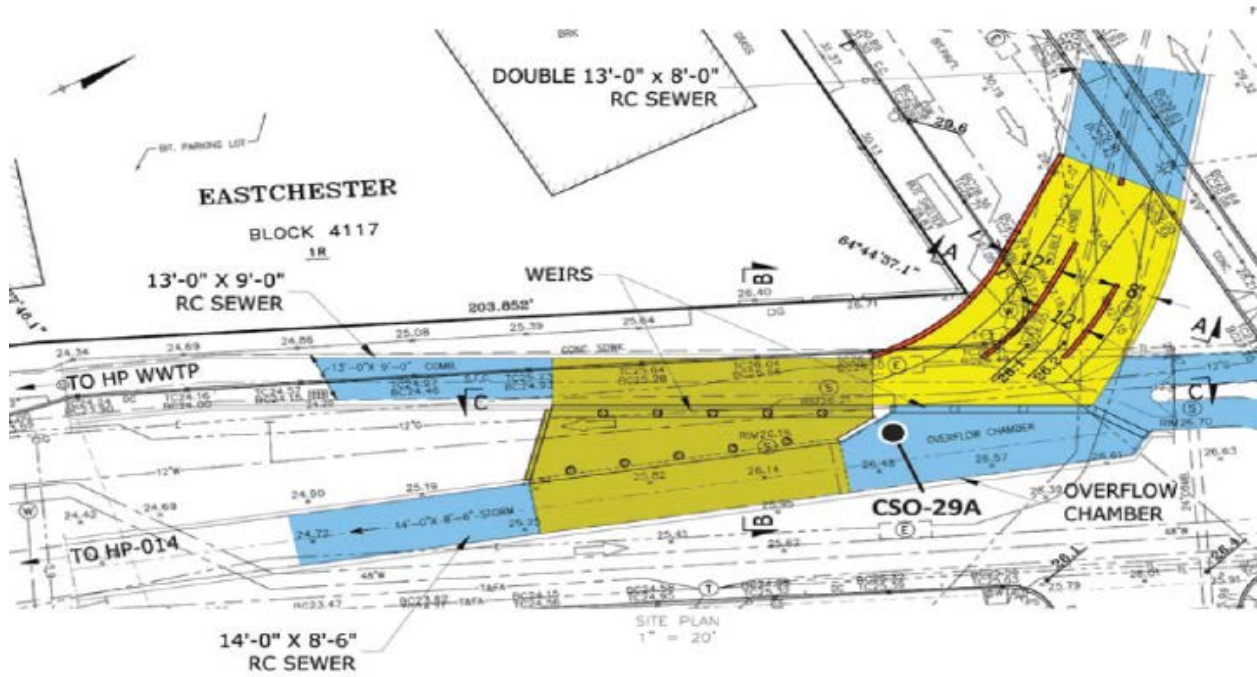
Proposed WWFP Element, Weir Modifications at CSO-29A
